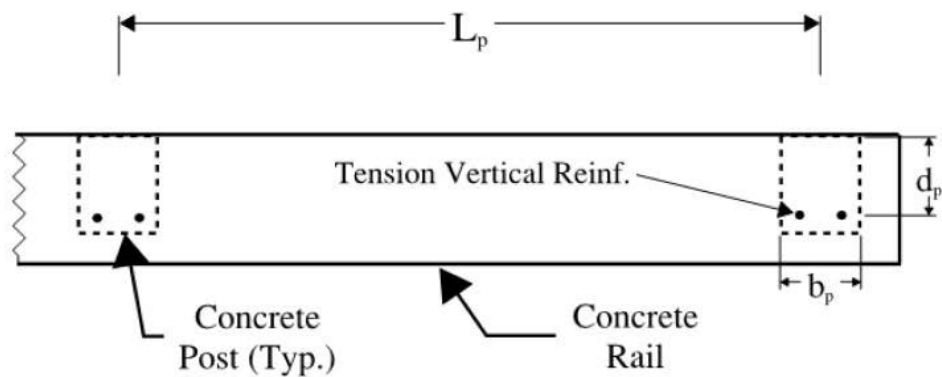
Plan View of a Concrete Post-and-Beam Railing showing Concrete Post Inputs
